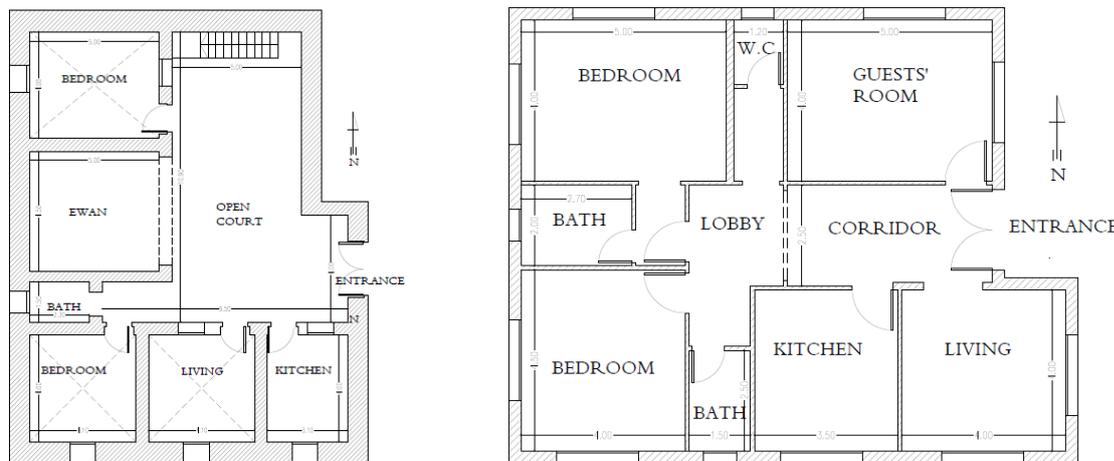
The most used traditional house of 147m² (left) and the modern house of 140m² (right)
